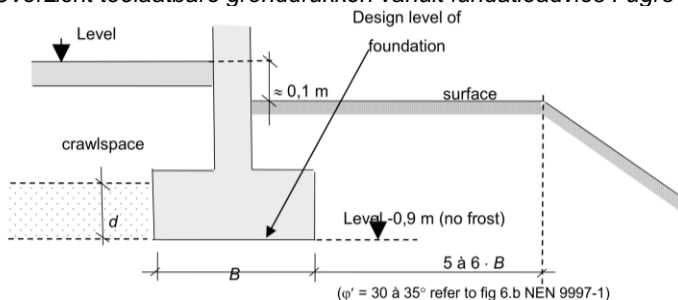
Leading soil coverage  $d$  next to the foundation (strip- or rectangular footing)
